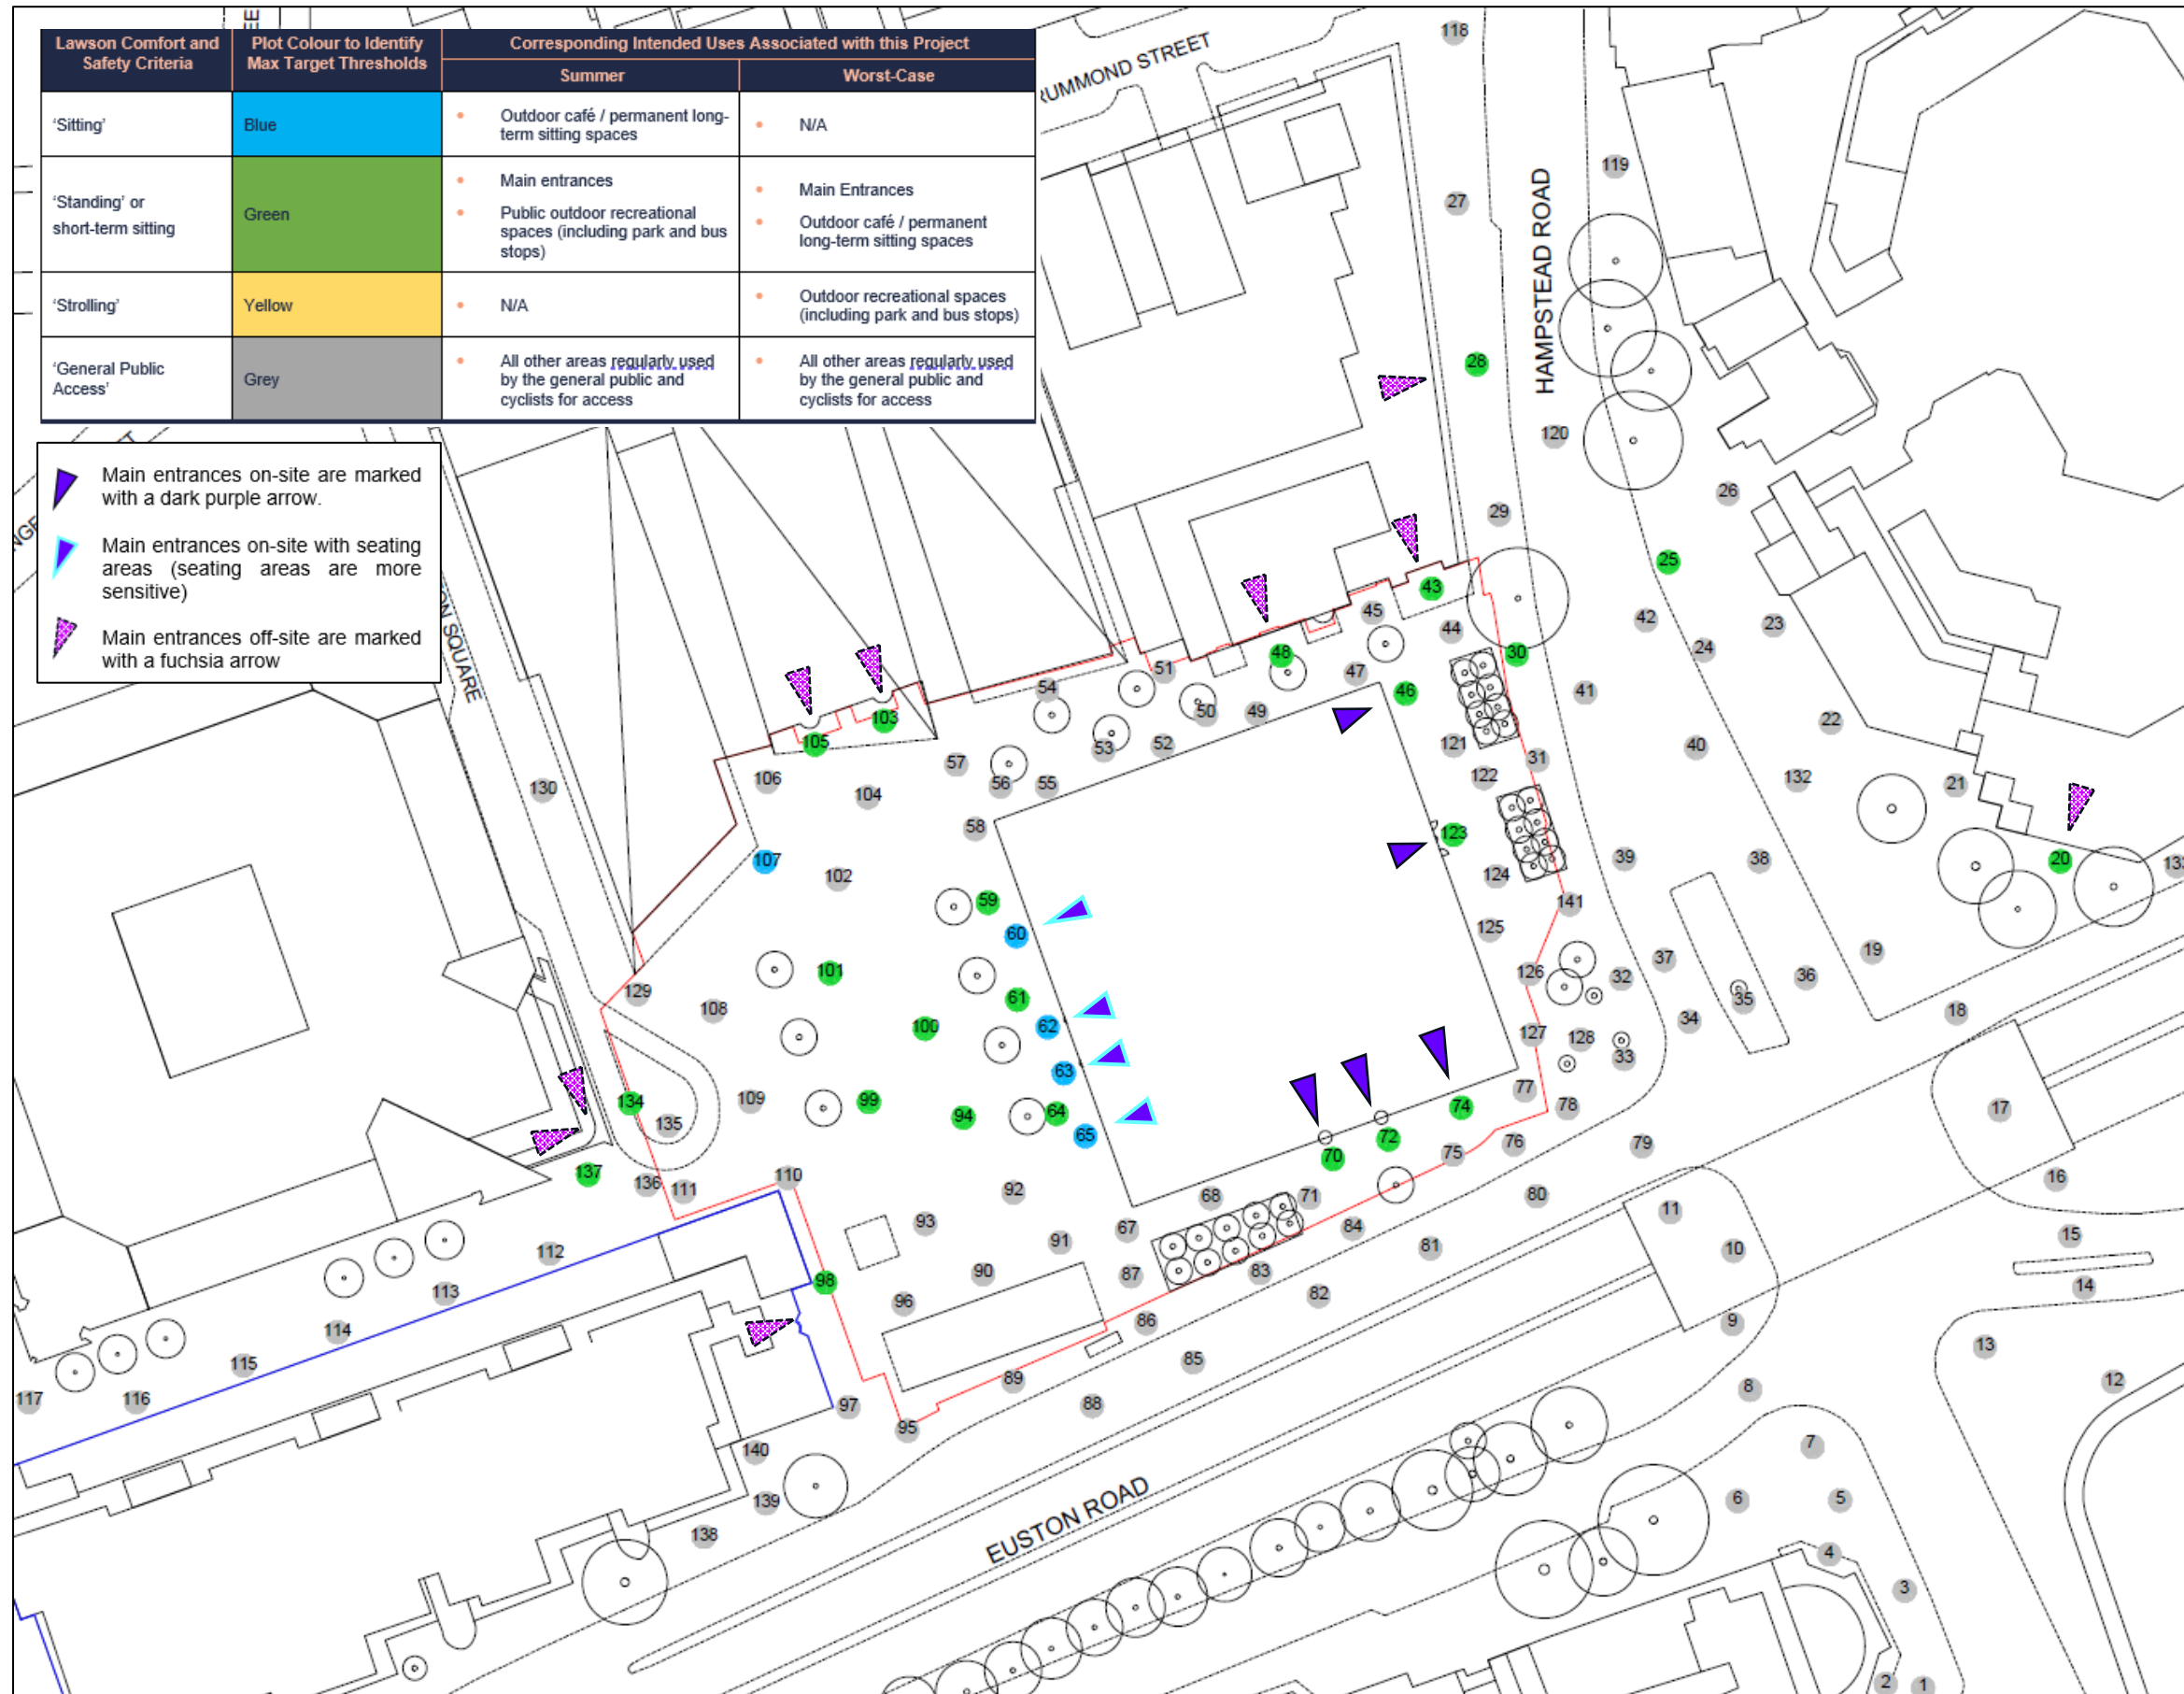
Ground Floor Plan of the Amended Proposed Development Showing the Locations of Entrances.
